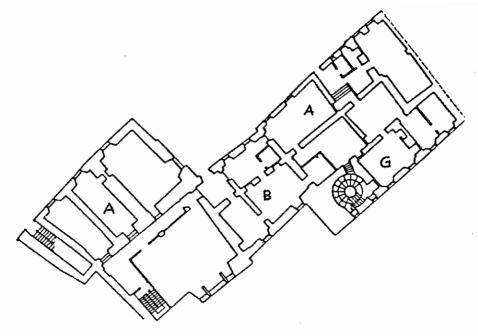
Gentile's Houses plan (detail of fig. 1 above)
